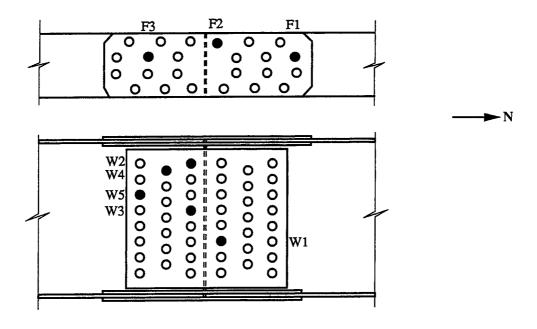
(e) Location of sampled bolts in connection S3 of bridge B2
